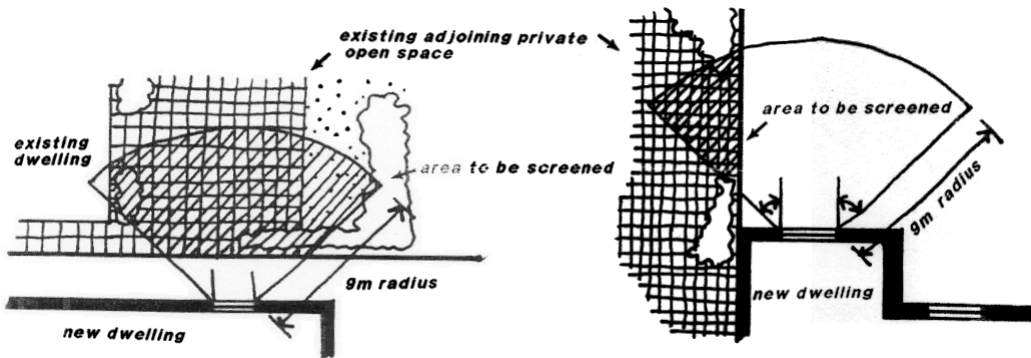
SCREENING VIEWS TO ADJACENT PRIVATE OPEN SPACE
